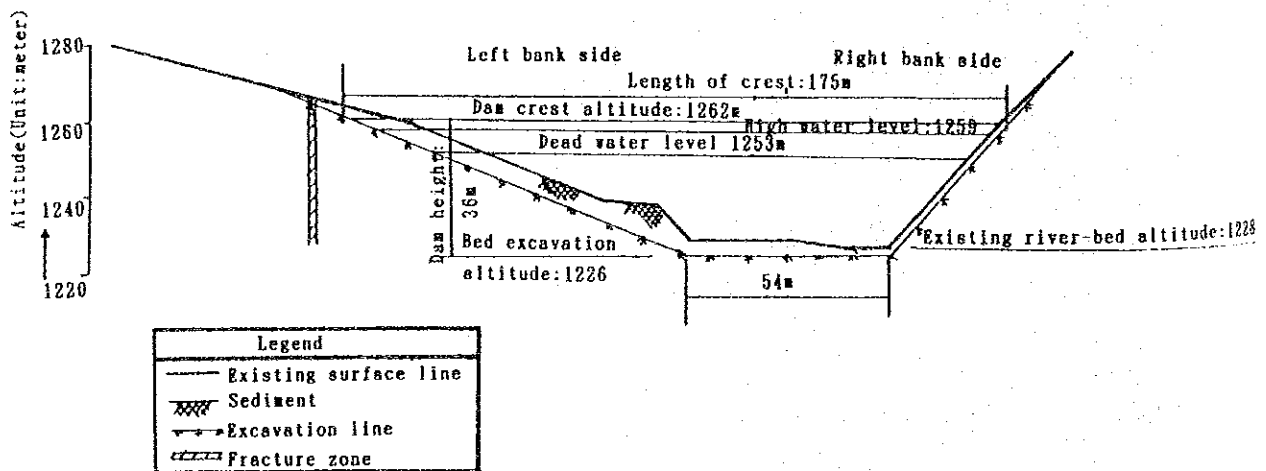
Profile of Proposed Dam Site D-3 on Rio Grande
